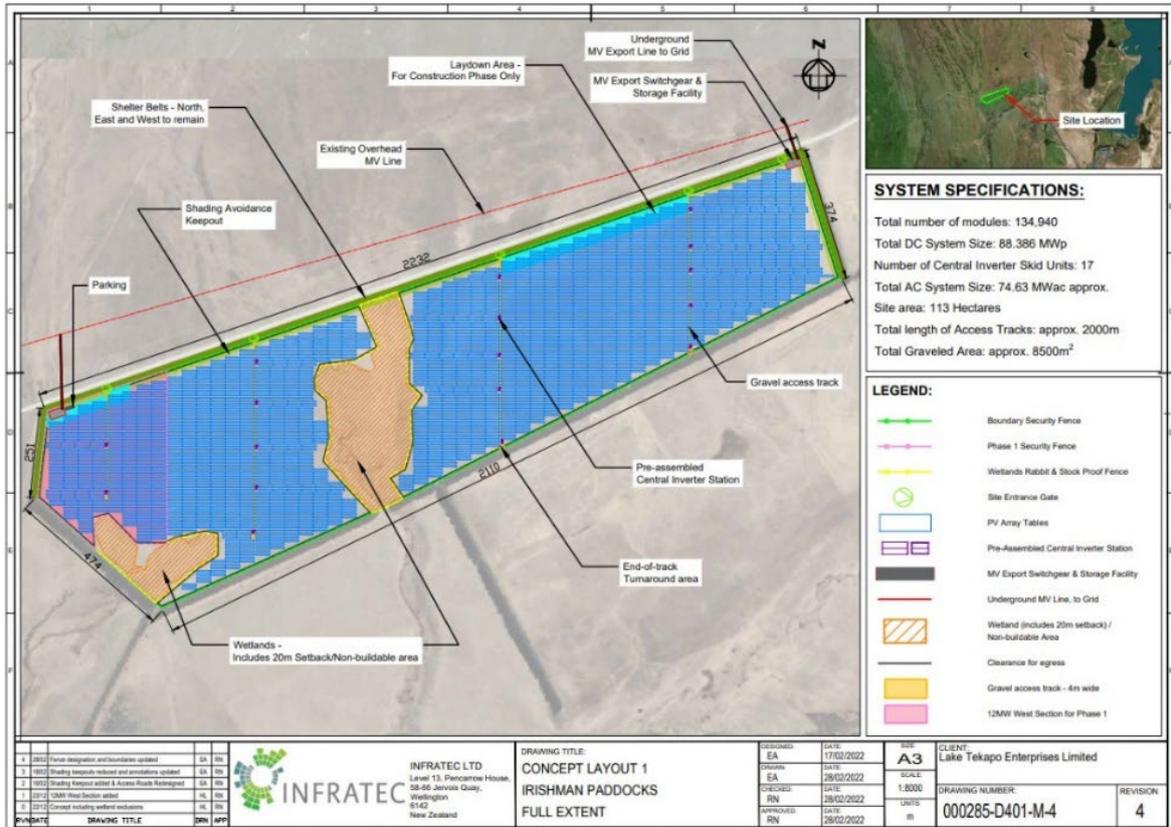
(b) Easement Area - Concept Completion Plan (refer Attachment G. p.2)
